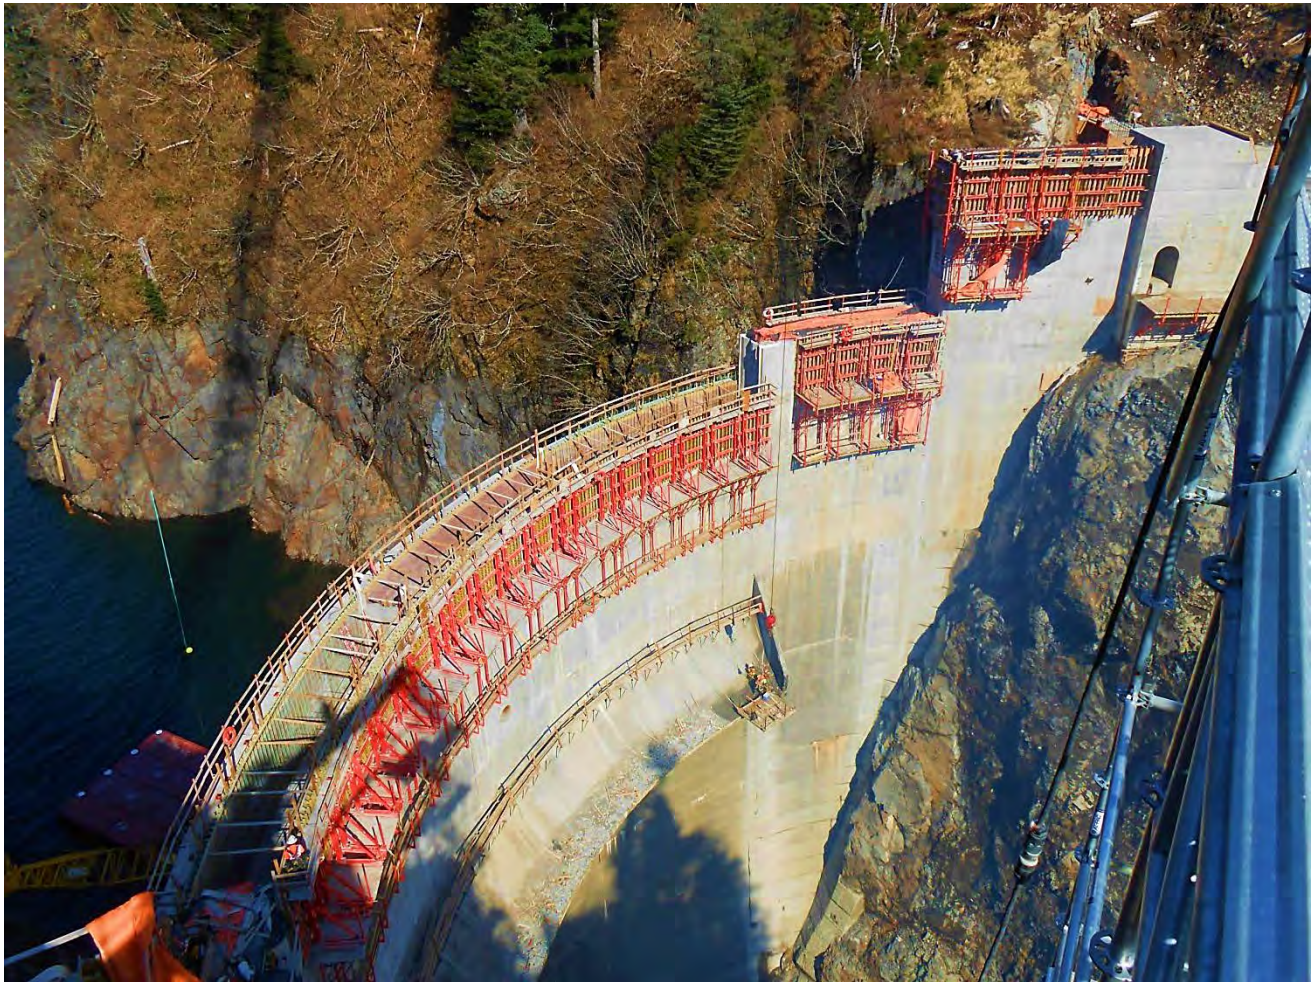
Dam and Left Abutment Area, – Barnard showed good progress on the dam construction completing 9 block placements.
